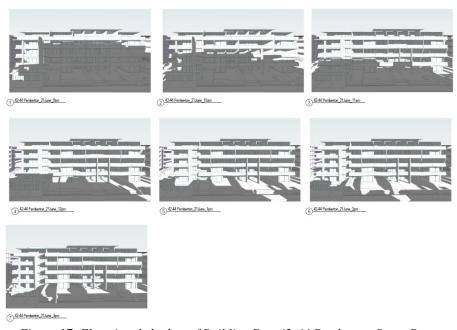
Elevational shadow of Building D at 42-44 Pemberton Street Botany
